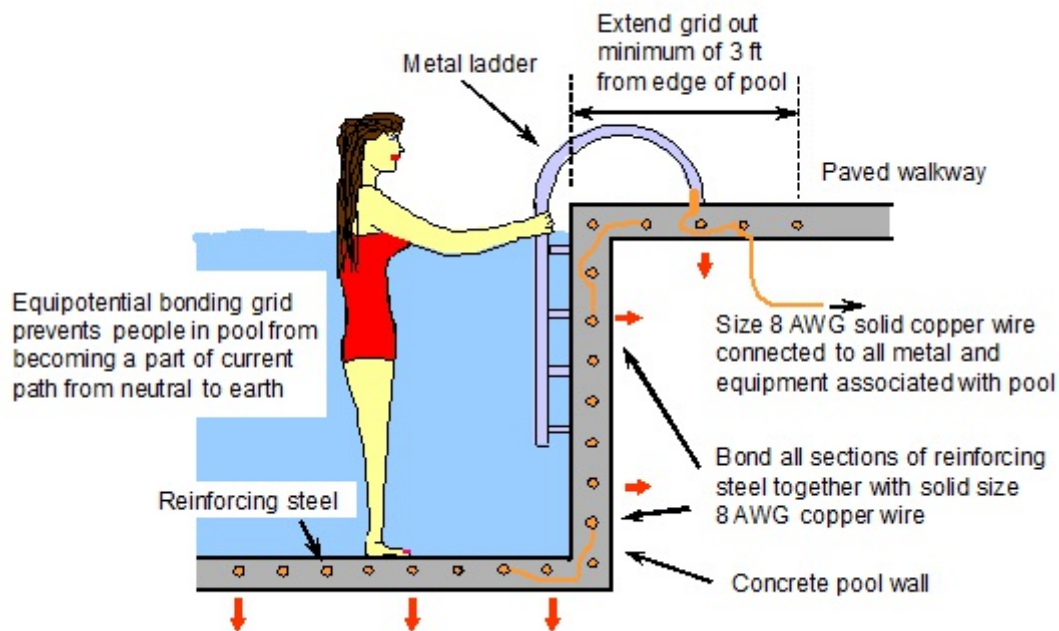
Paved walkways around pools and concrete pool walls and floor are required to have an equipotential grid that is bonded to all metal associated with the pool using a solid copper wire not smaller than size 8 AWG.
